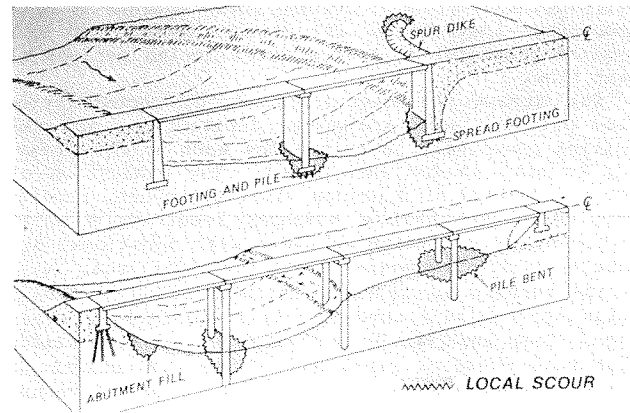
Diagram of local scour at bridge piers and abutments.
